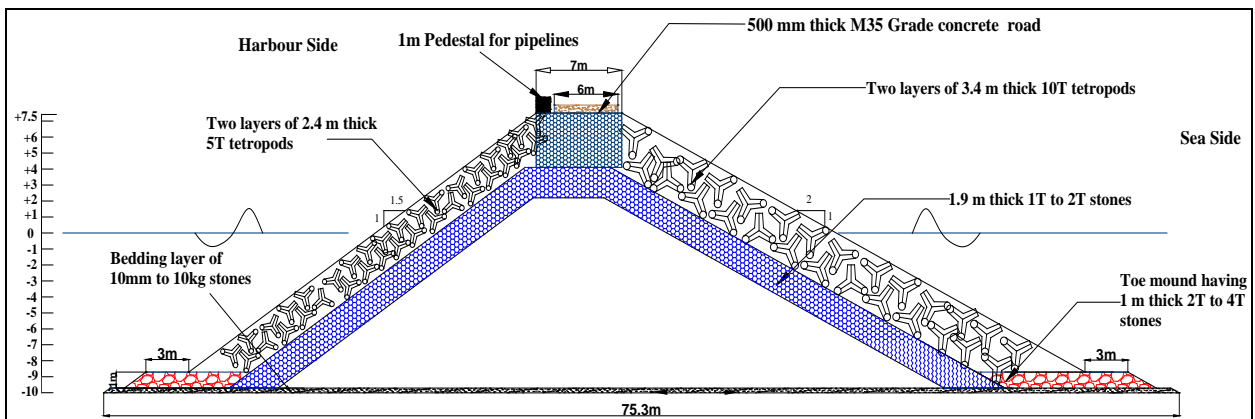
Typical breakwater trunk section for water depth of 8m to 10m
